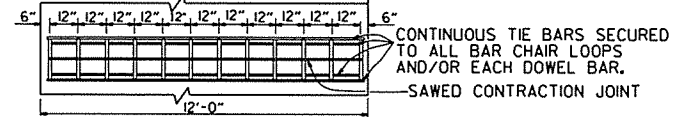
DETAIL OF SAWS CUT TIED LONGITUDINAL JOINT
